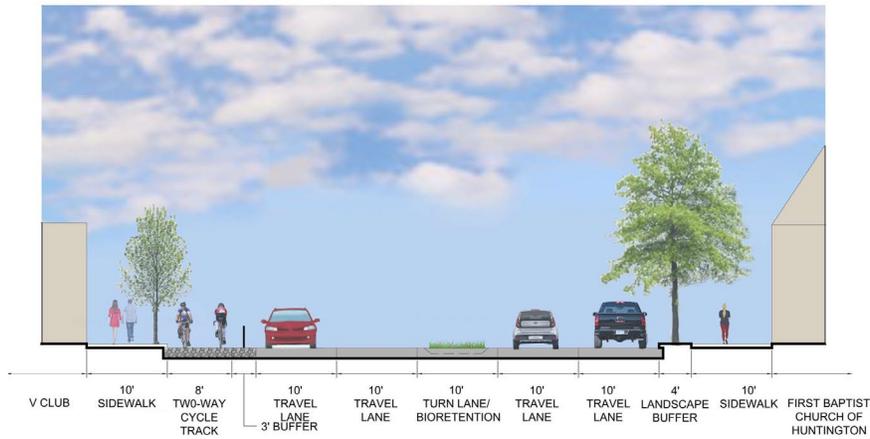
8th Street Underpass (7th Avenue to 5th Avenue)
